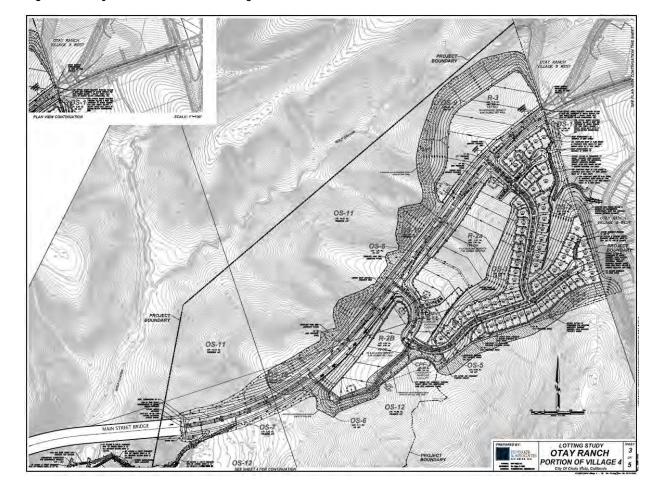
Otay Ranch, Portion of Village Four SPA Site Utilization Plan
